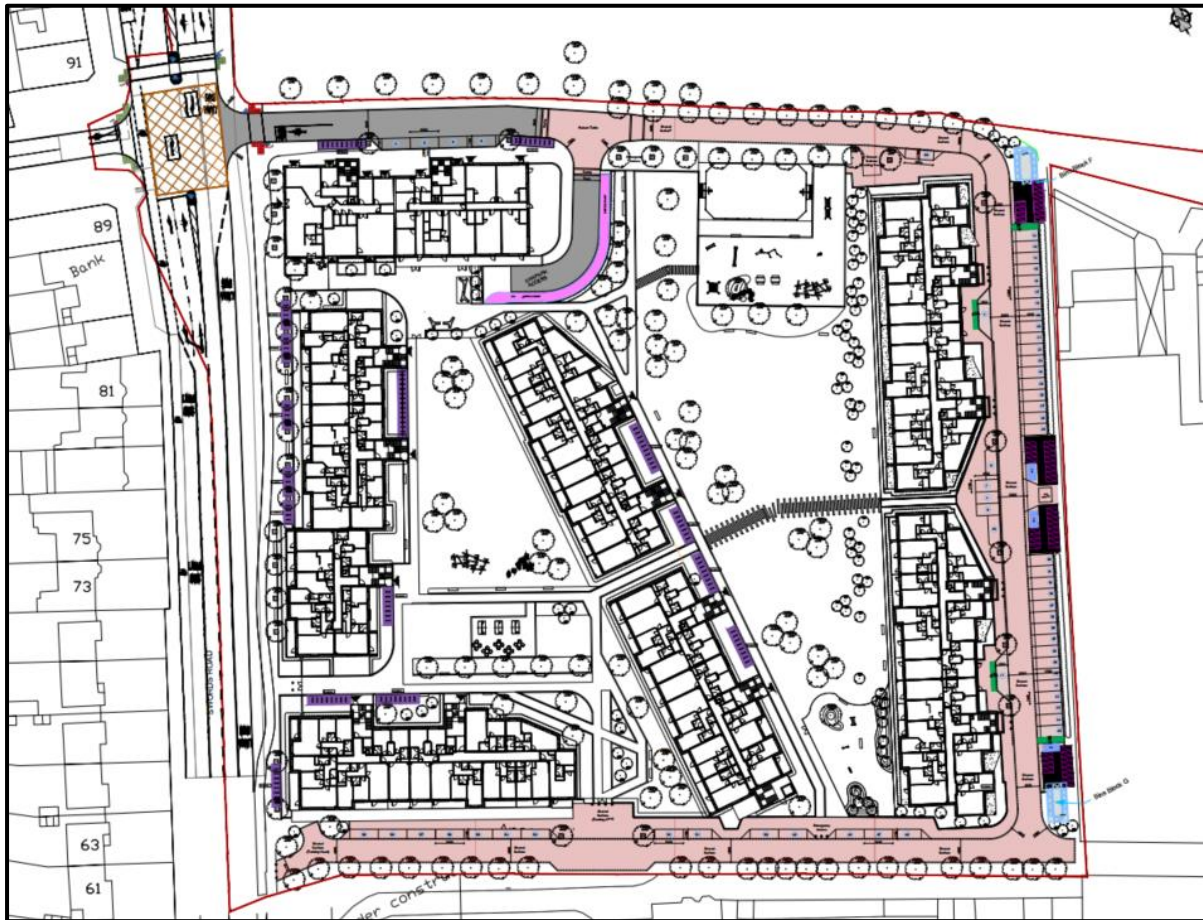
Proposed Site Plan (Source: AECOM)
